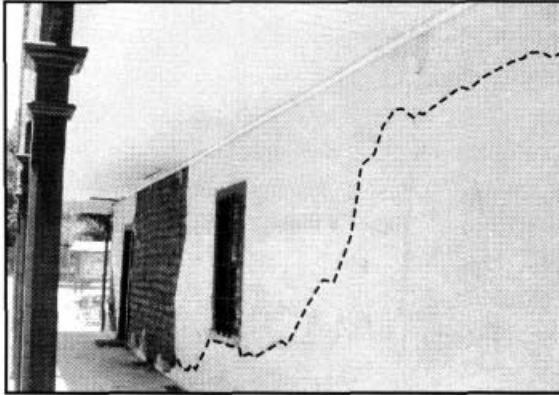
Exterior of south wall outside Rooms 8 and 9. A flexural crack starts at the anchorage at the upper right of the photo (anchorage not visible except for plaster cracking) and extends to the base of the window and then to the lower part of the wall (dotted line along crack).
